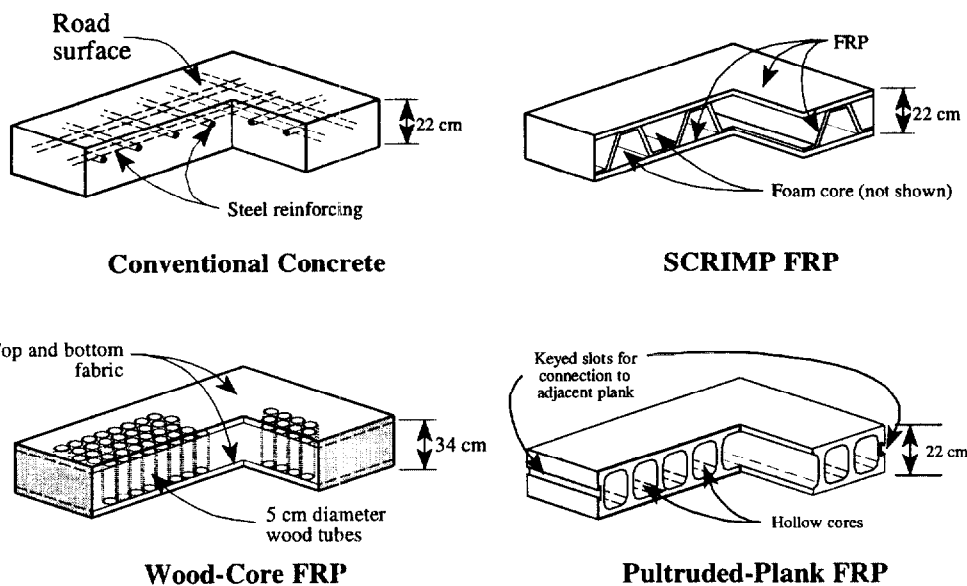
Conventional-Concrete Bridge Deck and Three FRP Bridge Decks
